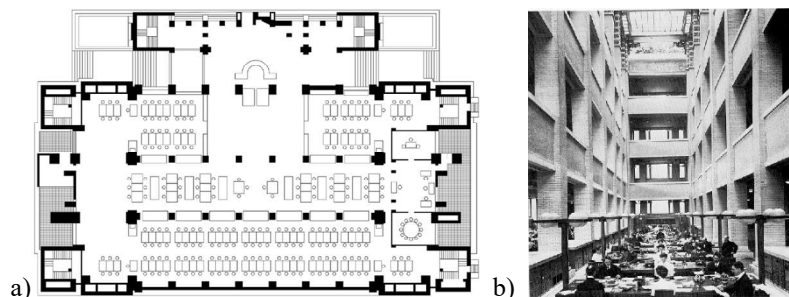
a) 1st floor layout for Larkin Building (1904-1945), Frank Lloyd Wright 4.[16] b) Open plan offices in the atrium of Larkin Building (1904-1945), Frank Lloyd Wright 4.[20]
